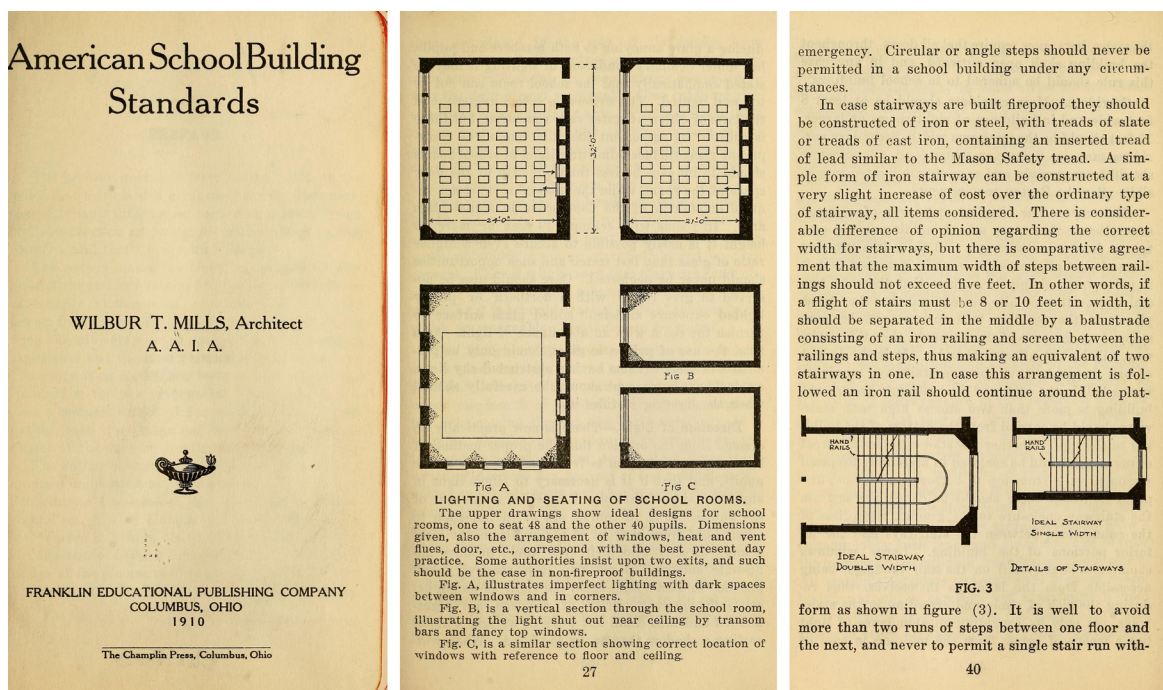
Wilbur T. Mills’s American School Building Standards. Source: Library of Congress, <https://www.loc.gov/item/11001012/>
